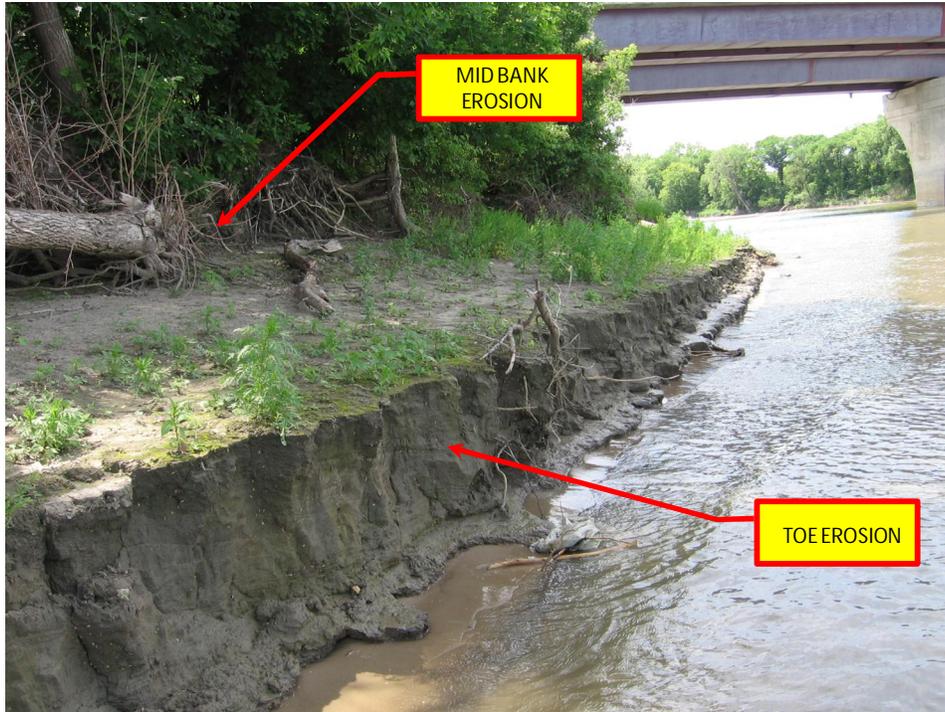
Toe and mid bank erosion on east bank facing (upstream) south.
